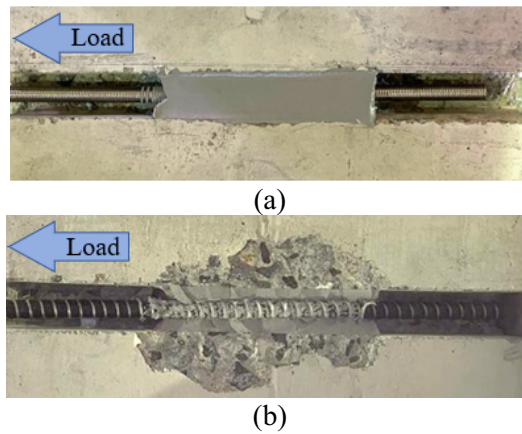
Failure modes observed in (a) TiA specimen and (b) CFRP specimen.
